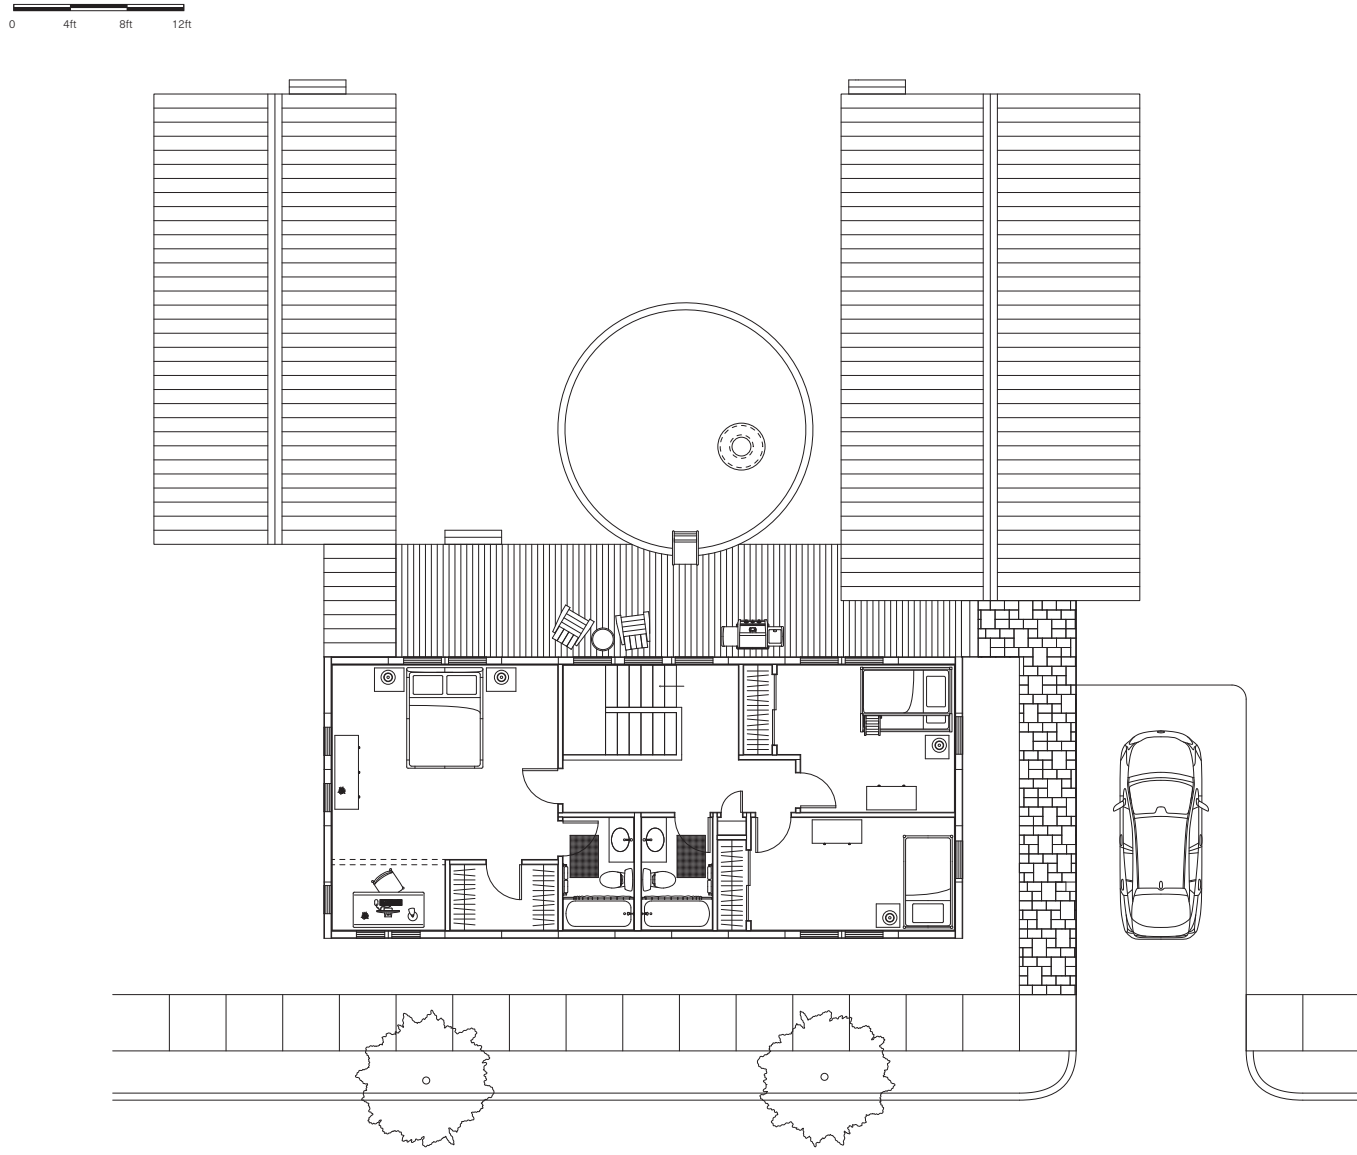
The Courtyard, Second Floor Plan, Fully Developed
